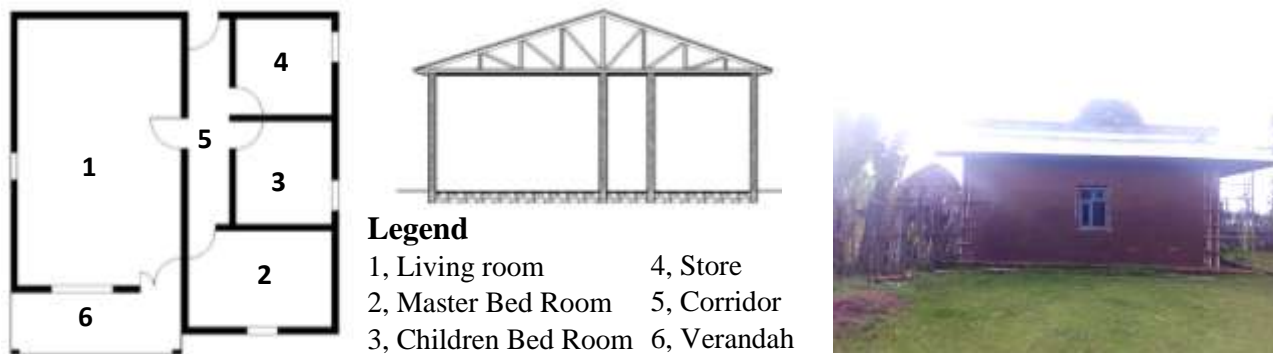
Ato Tadesse's brother new modern house plan, section and pic
